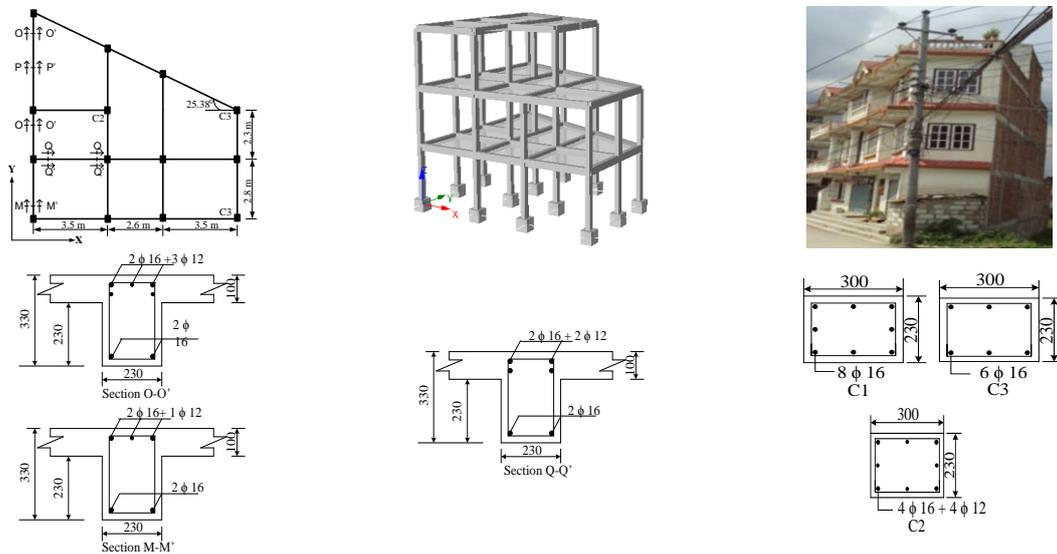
Plan, tridimensional model, and cross-section detailing of building model RC4
